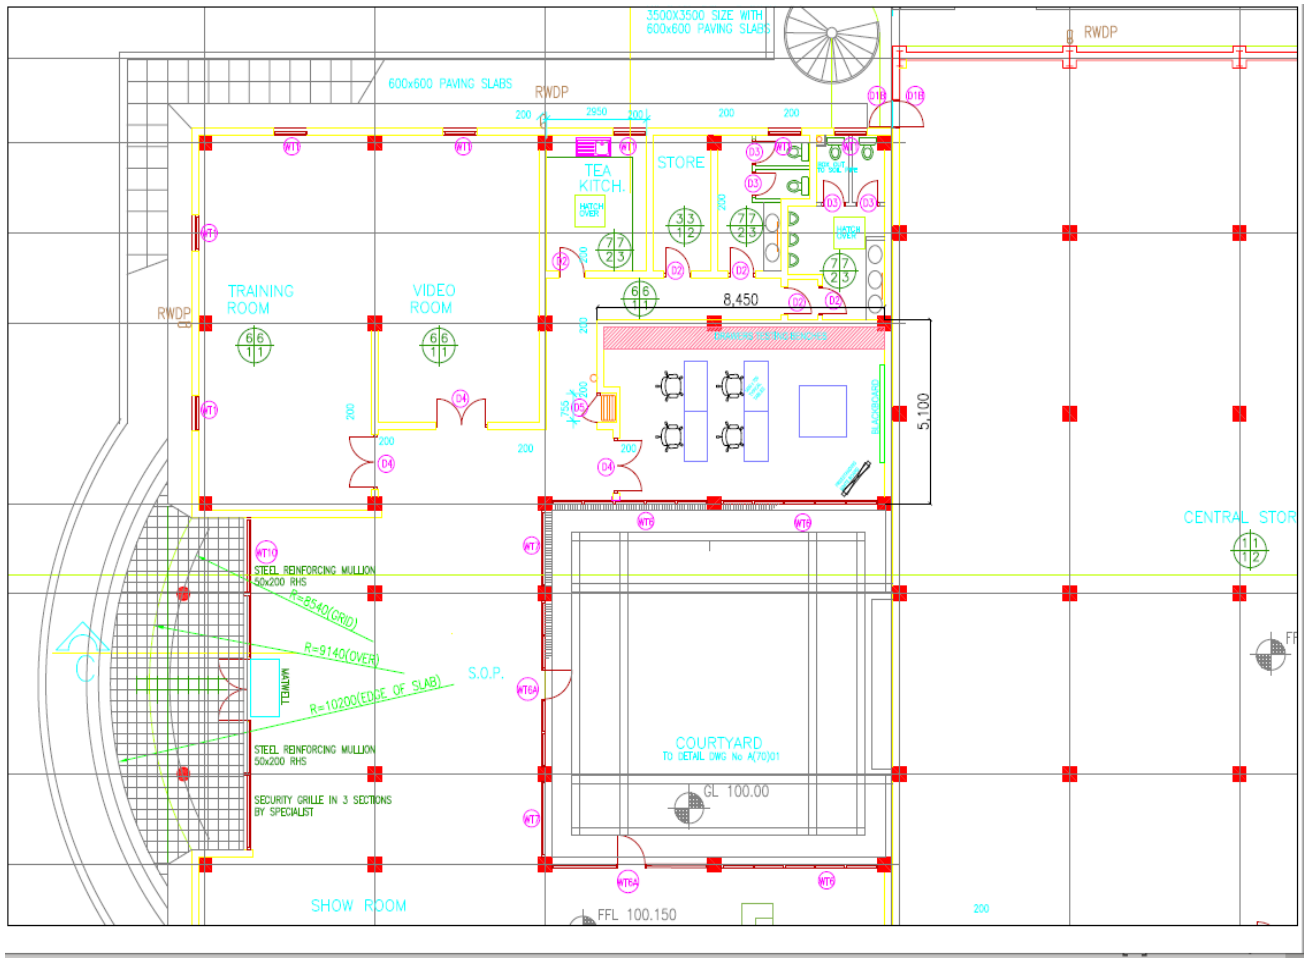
Schneider Electric Manufacturing Plant Layout [21]
